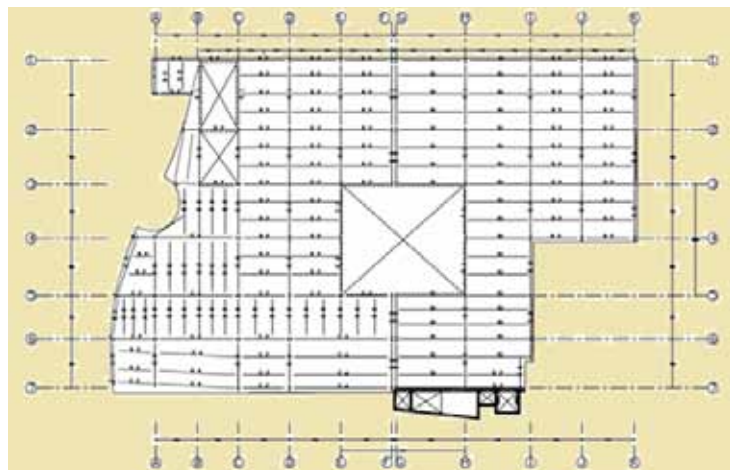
Column layout for the suggested composite construction of the flooring system of the typical floor
